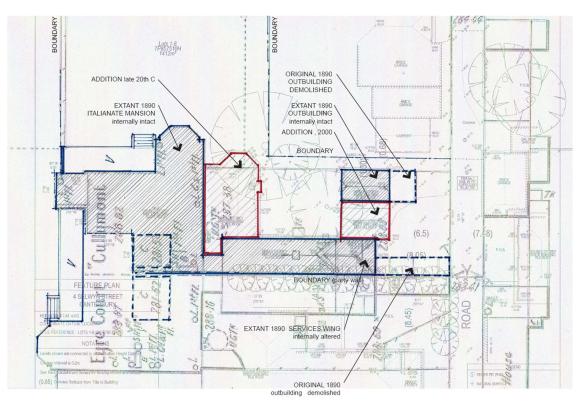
1907 MMBW plan overlaid on 2022 land survey, identifies the extant mansion and outbuilding, the existing building which have been demolished, and the recent additions. North is to the top of the page.
